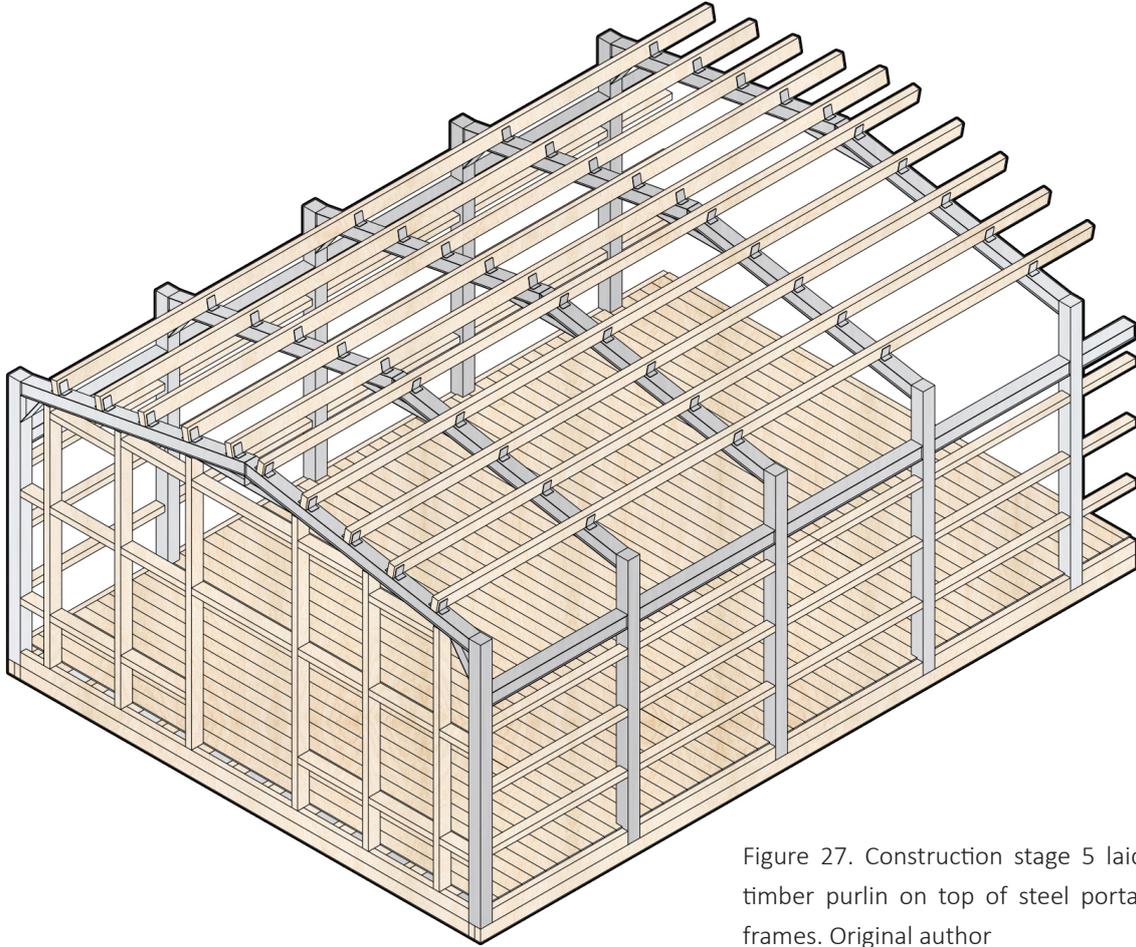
Construction stage 5 laid timber purlin on top of steel portal frames. Original author
